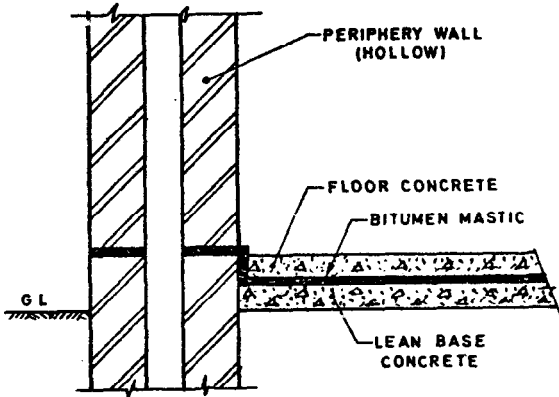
TYPICAL ARRANGEMENT OF CONTINUOUS DAMP-PROOING IN WALL AND ADJACENT FLOOR
